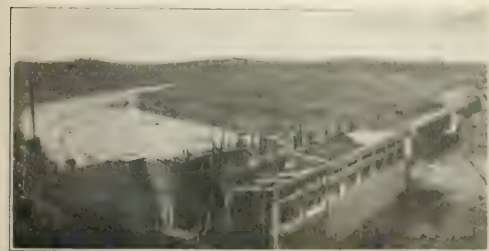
POWER HOUSE AND DOWNSTREAM FACE OF DAM
